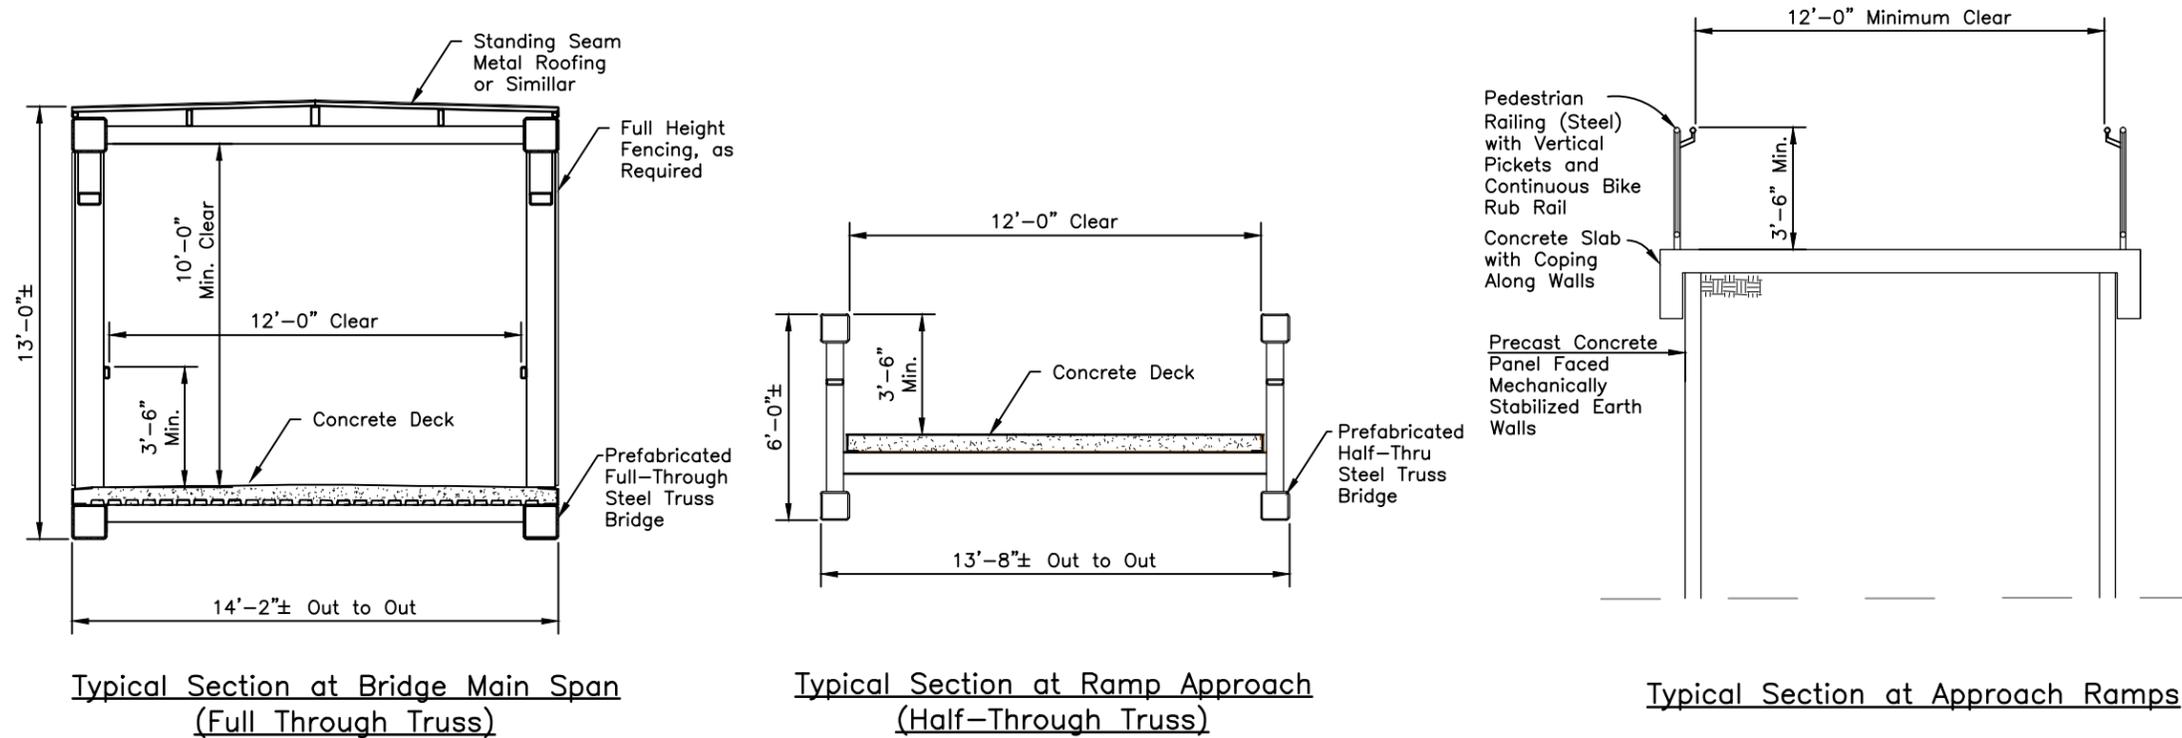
Hampden Avenue at Colorado Boulevard Crossing Pedestrian Bridge
